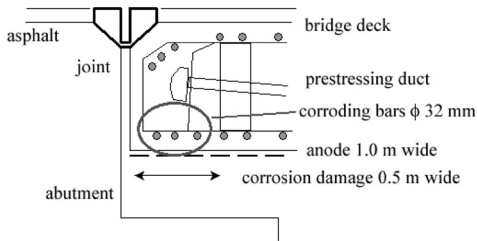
Schematic (longitudinal) cross section of bridge deck and abutment.
